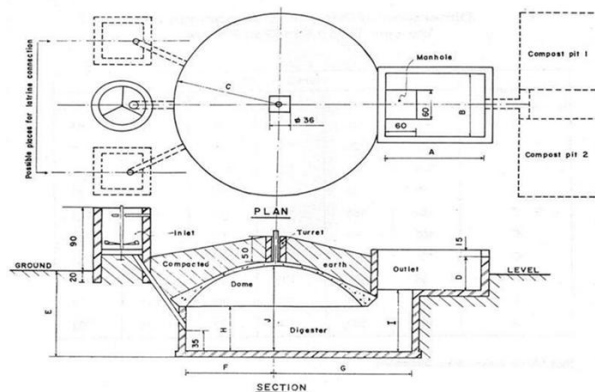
Technical design drawings for a standard dome-shaped household biogas plant.
